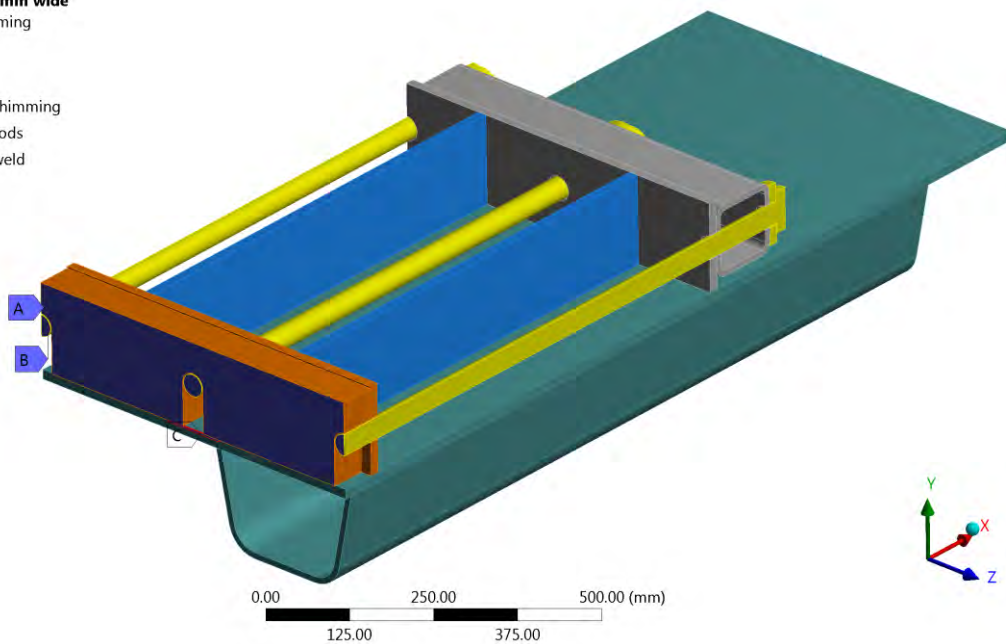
Symmetry at mid-plane between two joining beam girder sections
